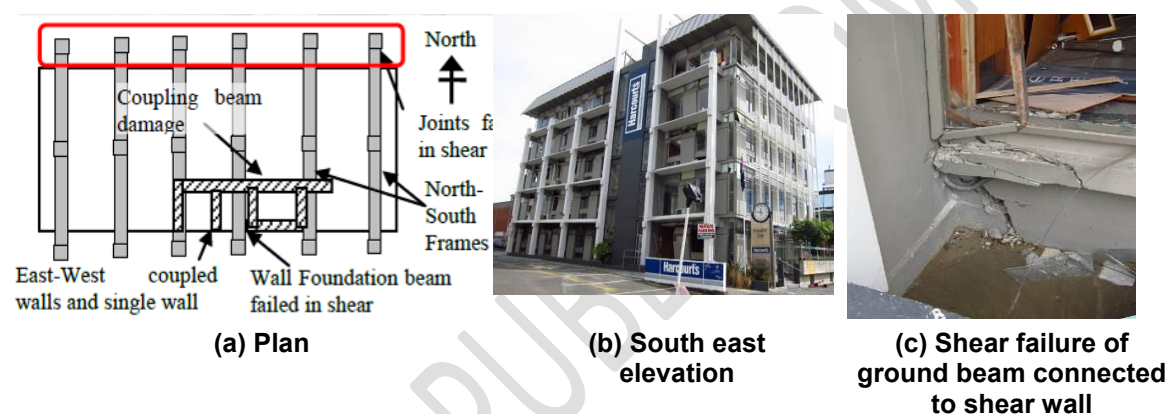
D.2: Five storey building with shallow foundation failure beneath core walls (adopted from Kam et al., 2011)
